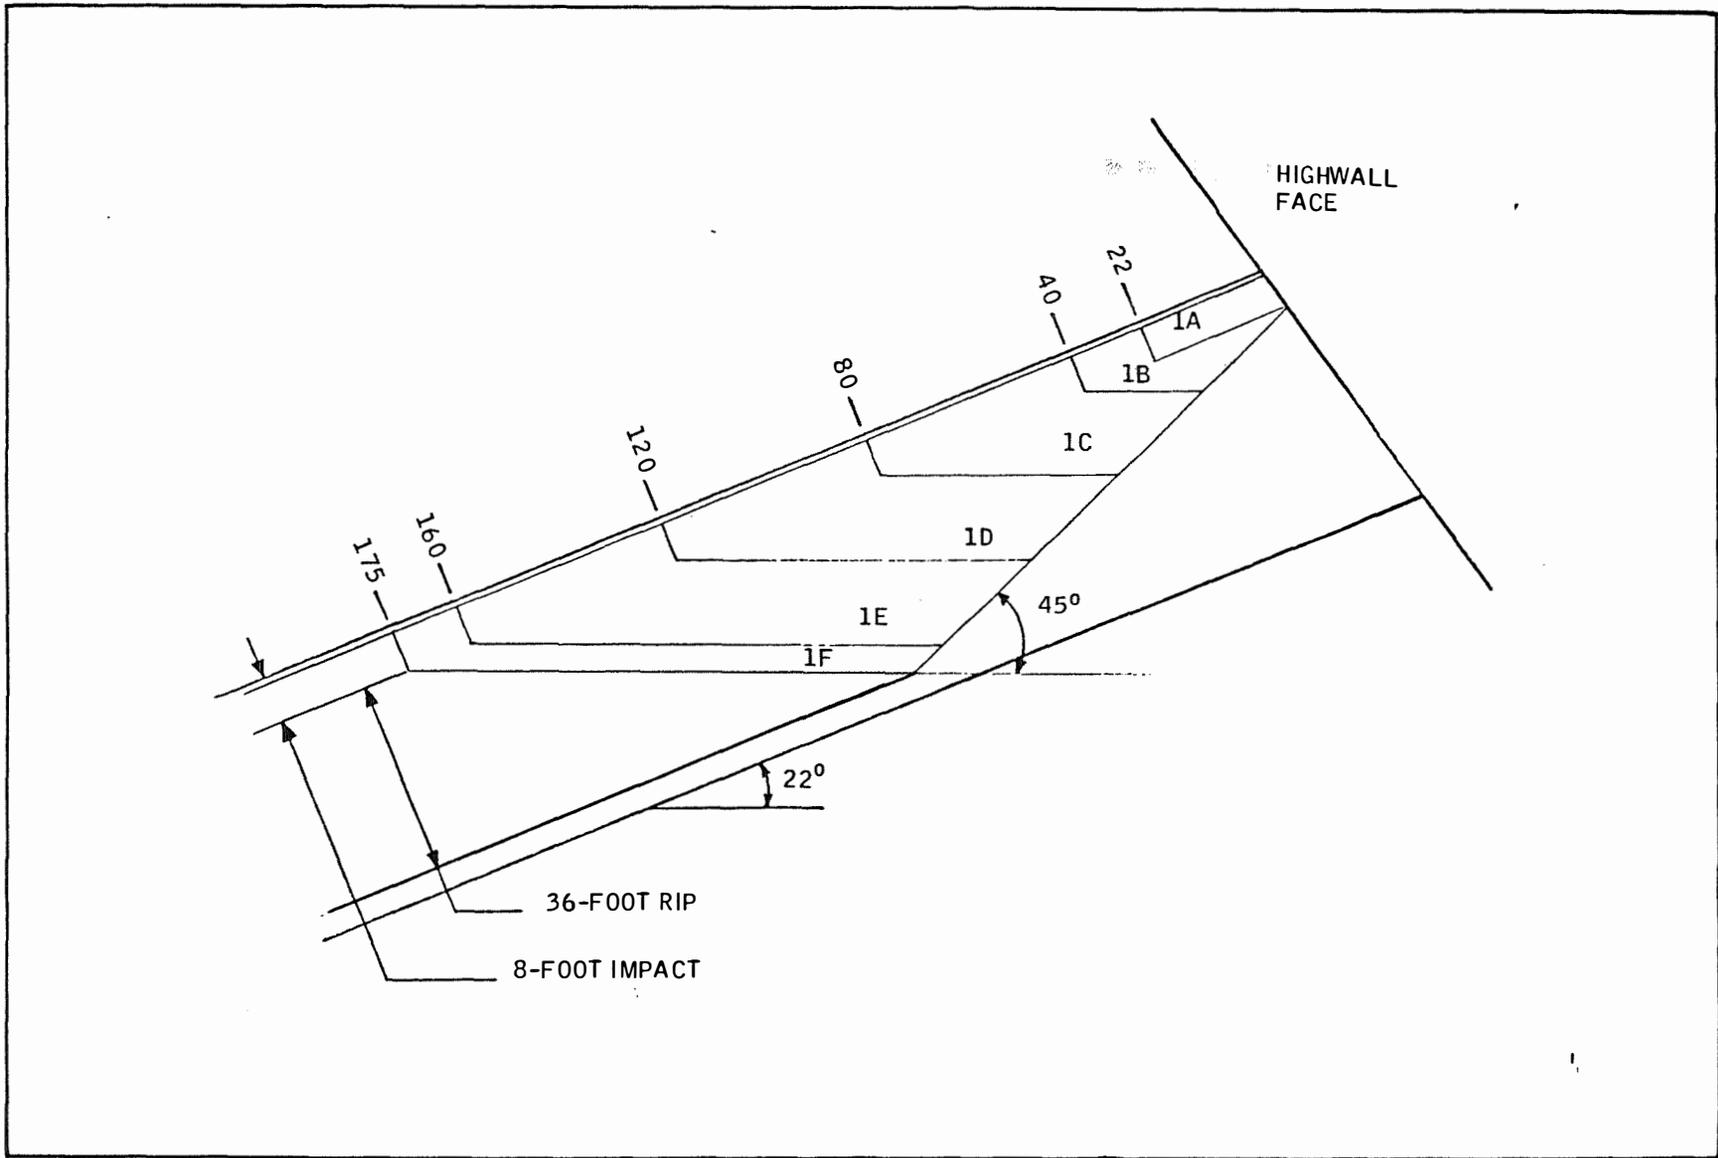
PROJECTILE SLACKLINE EXCAVATOR, SHIFT 1 MINING PLAN
